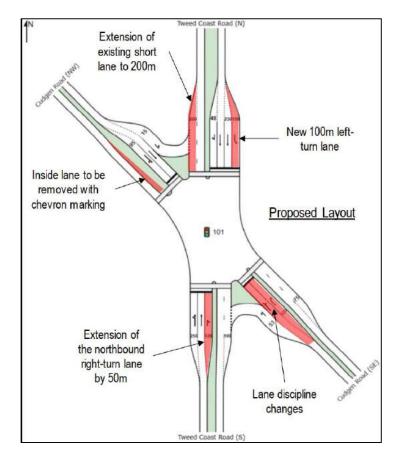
Tweed Coast Road/Cudgen Road – Upgrade Works (refer to civil drawings for detail)
